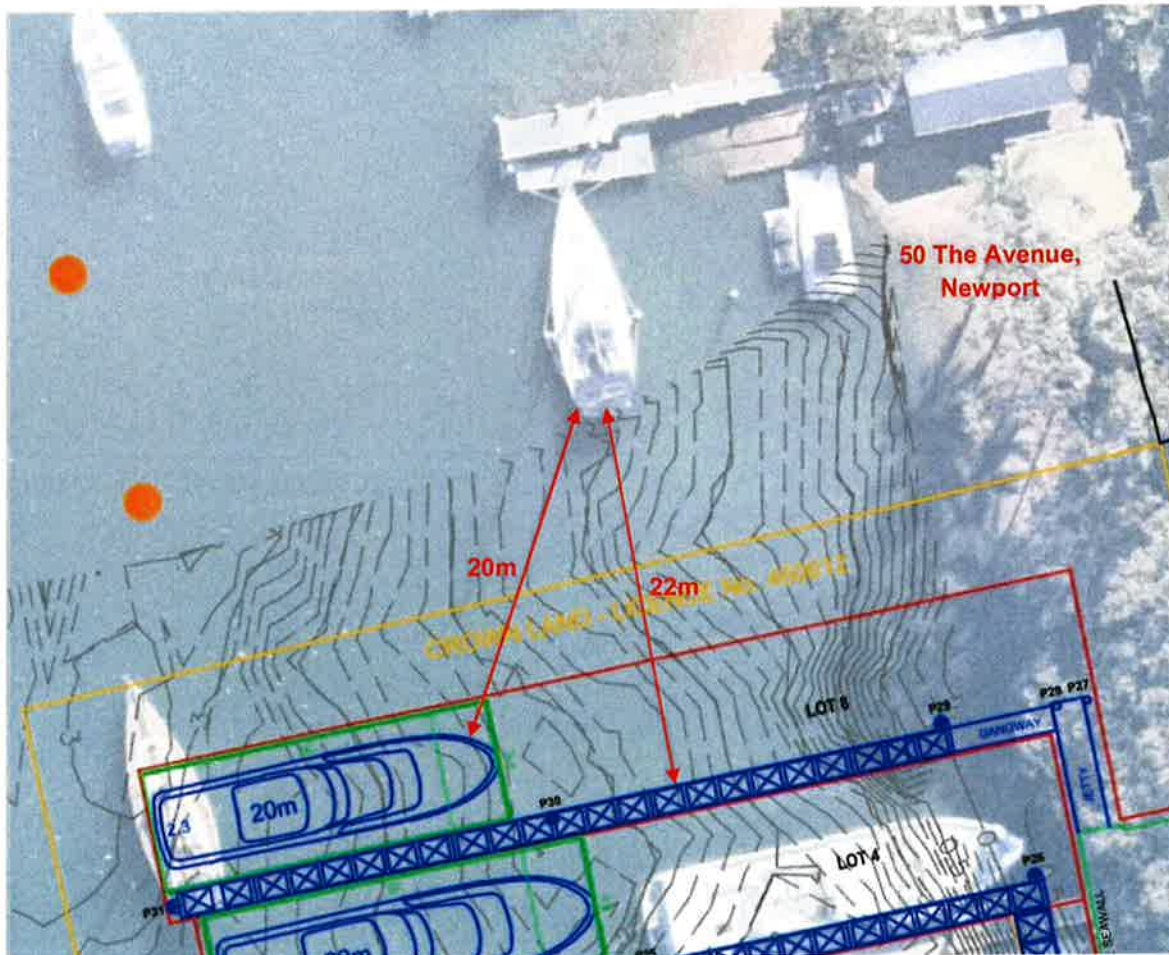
Navigation access distances for existing private jetty at 50 The Avenue, Newport
